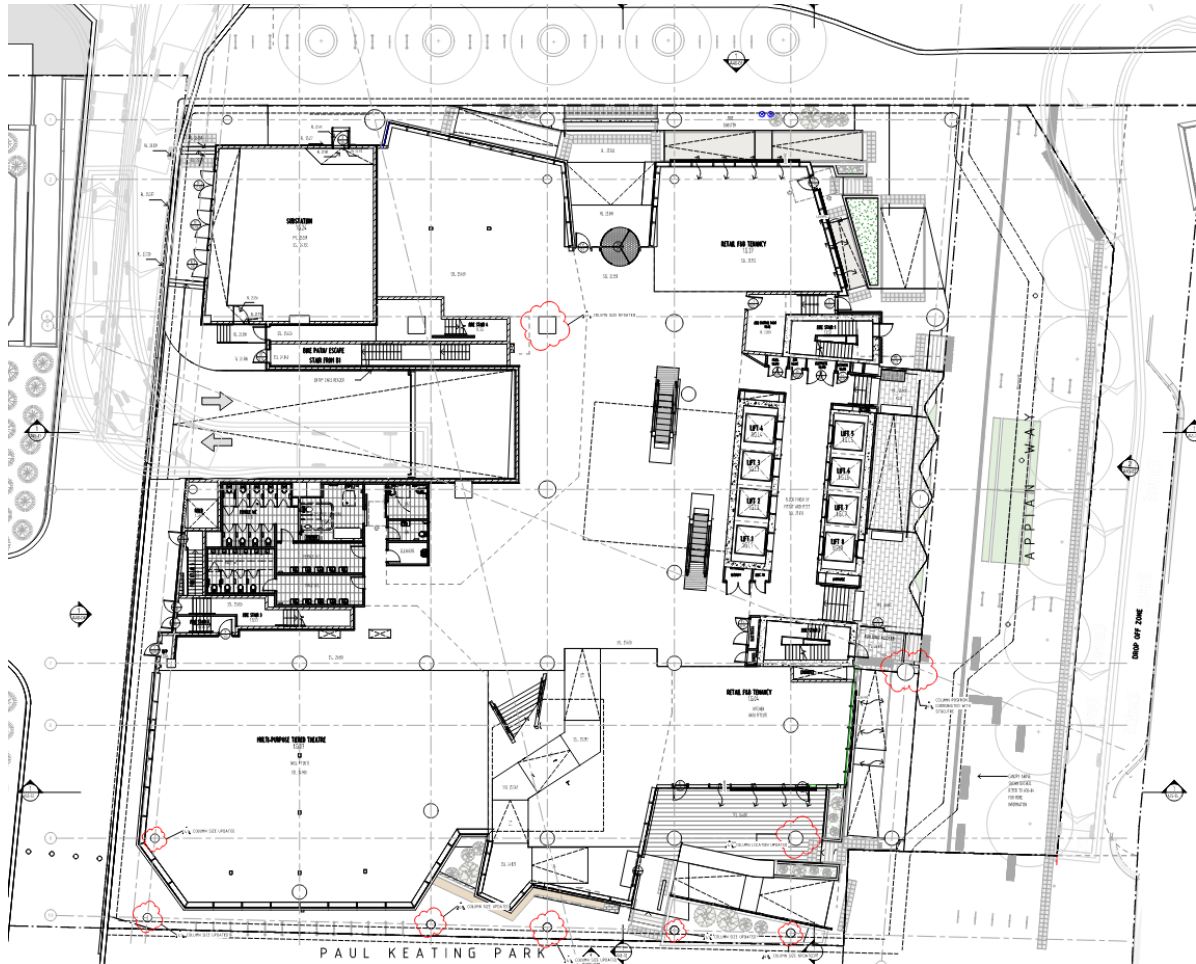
The Architectural Site Plan –Ground Floor (Lyons Architects dated 31/07/2020)
